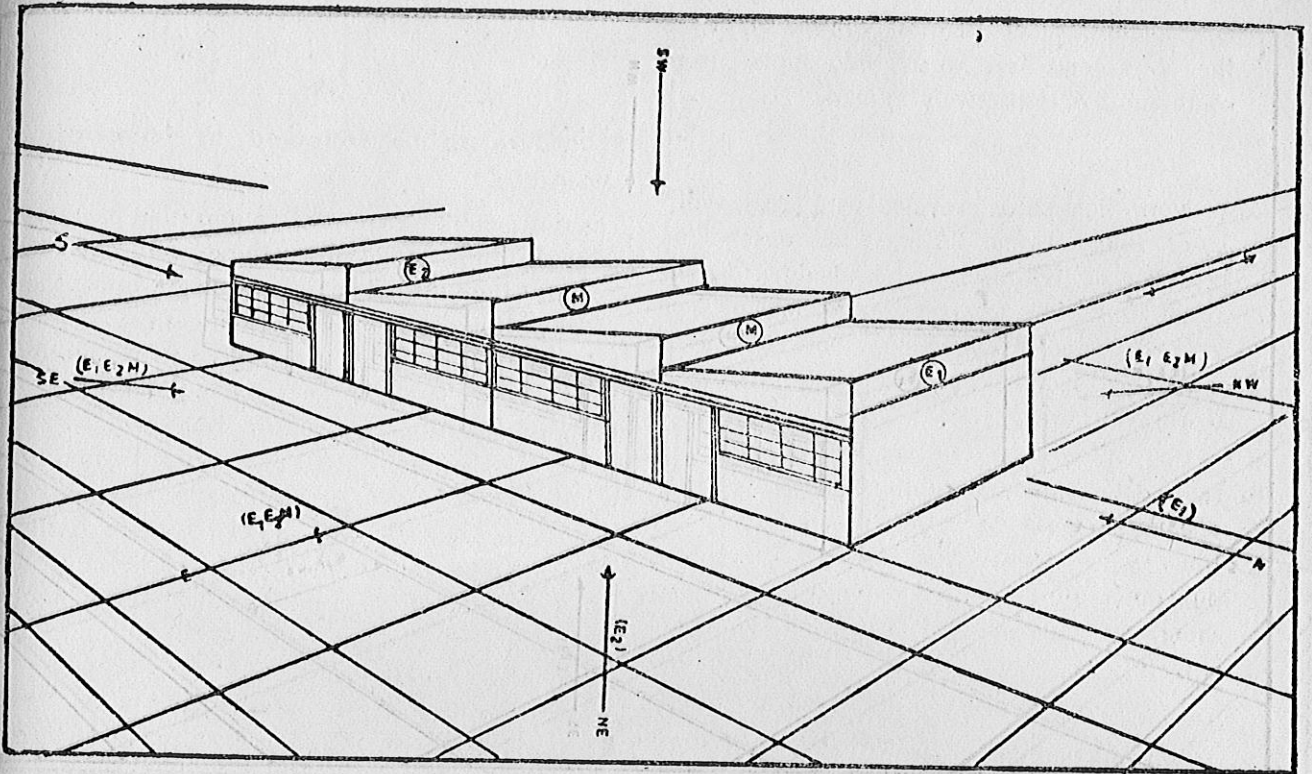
Preferred Location of Roof Openings in Northlight Sheds Having Windows on East Wall Only.
